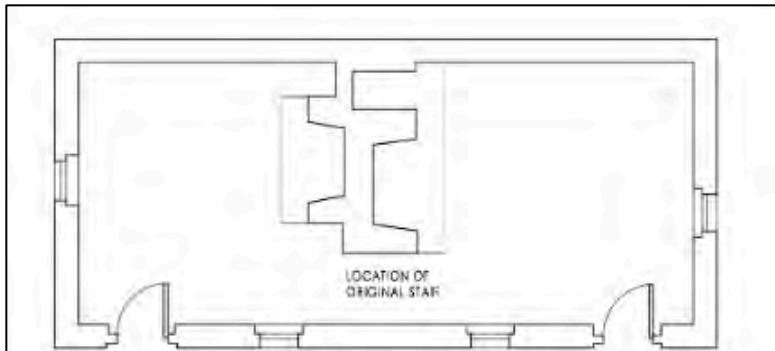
First floor plan of the Heyward Washington kitchen house (drawing by author).
